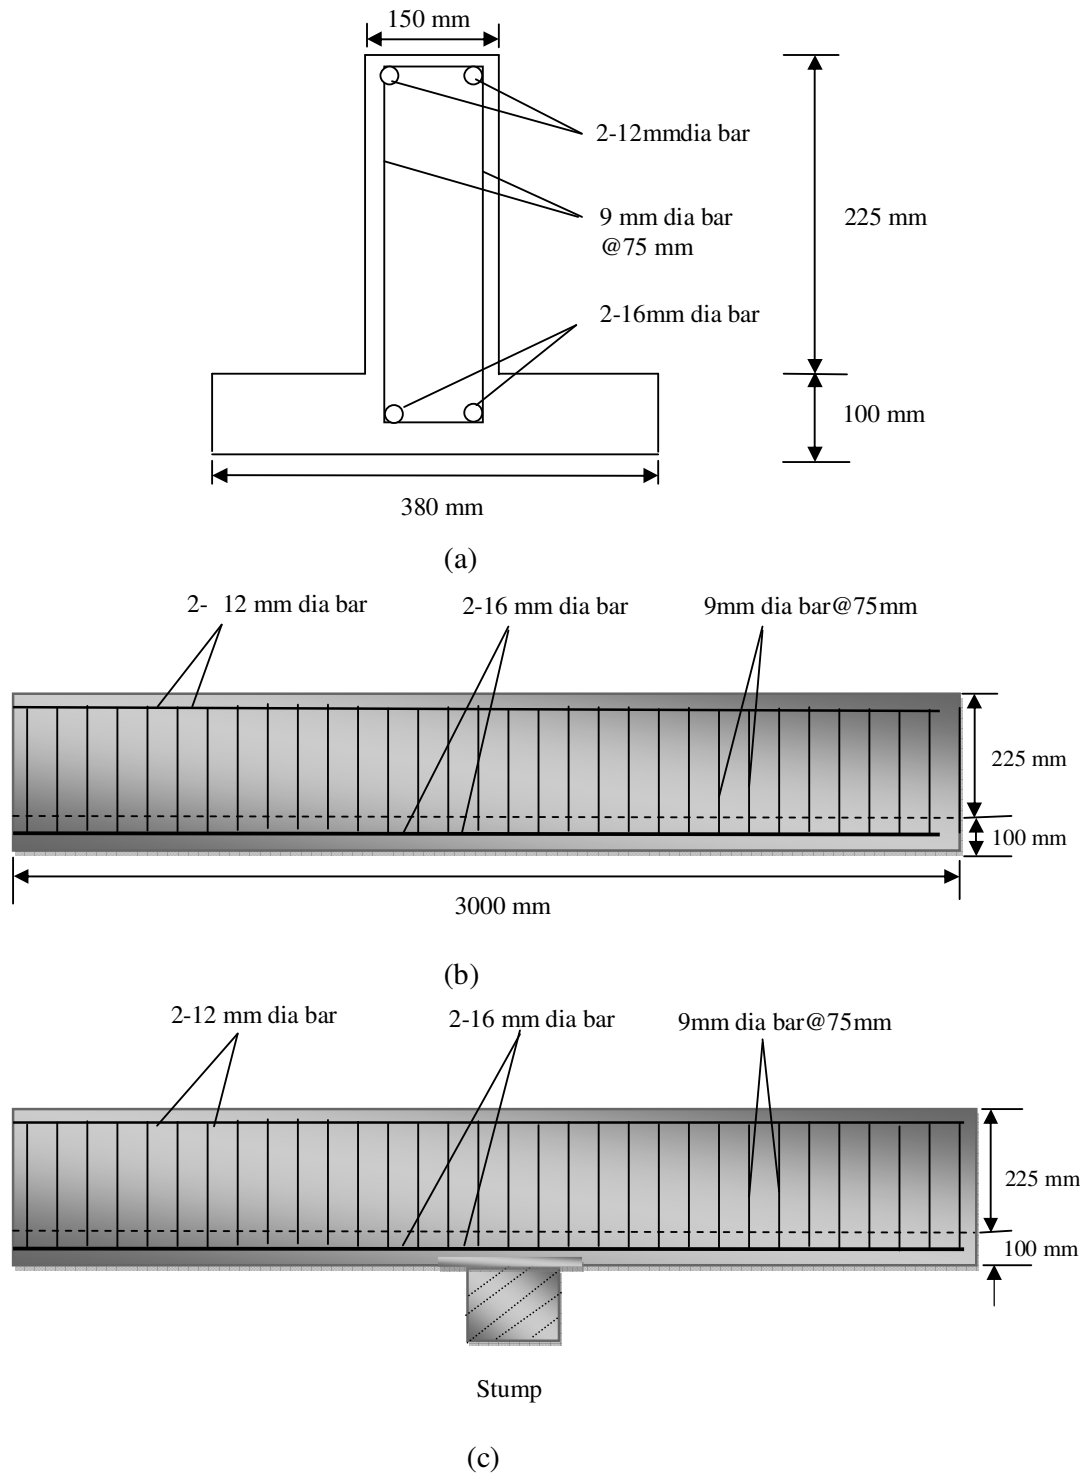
Beam geometry and reinforcement details: (a) cross section, (b) longitudinal section without stump, (c) longitudinal section with stump.
